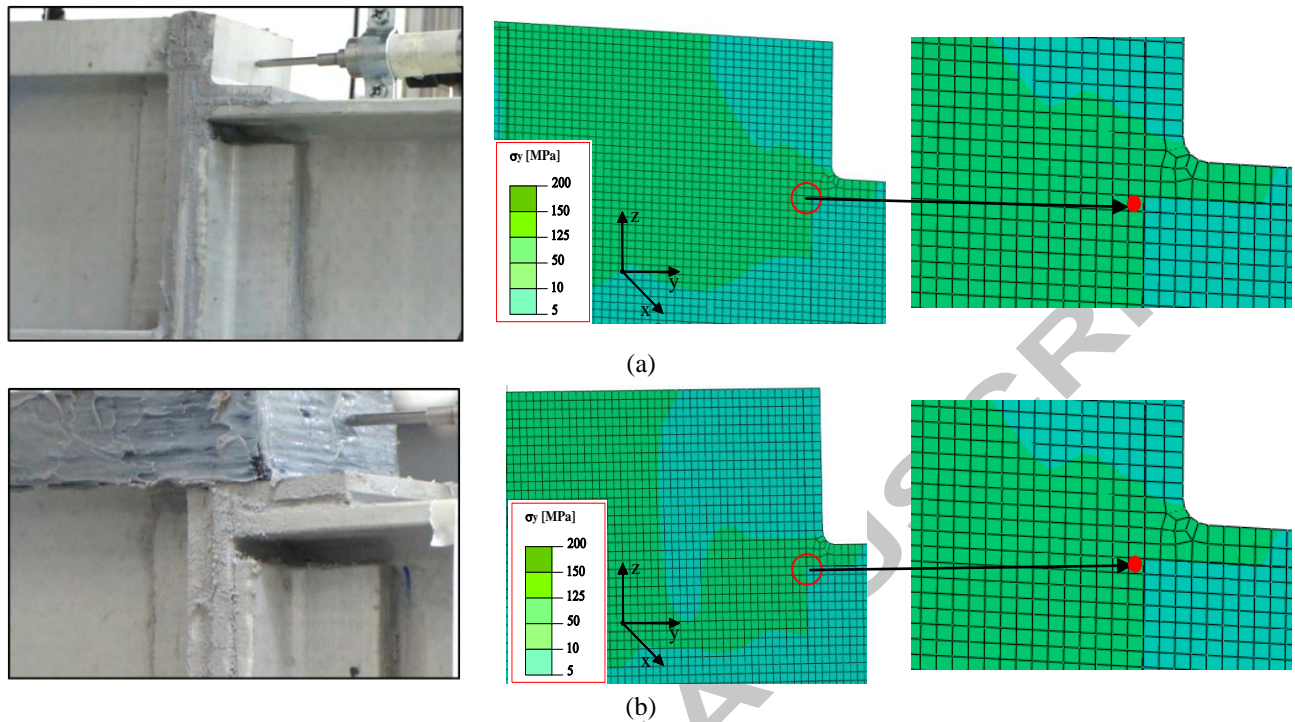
σ_y distribution: (a) BTCj_fcr connection; (b) BTCj_fcrw connection (Load level equal to 50% of the failure load).
